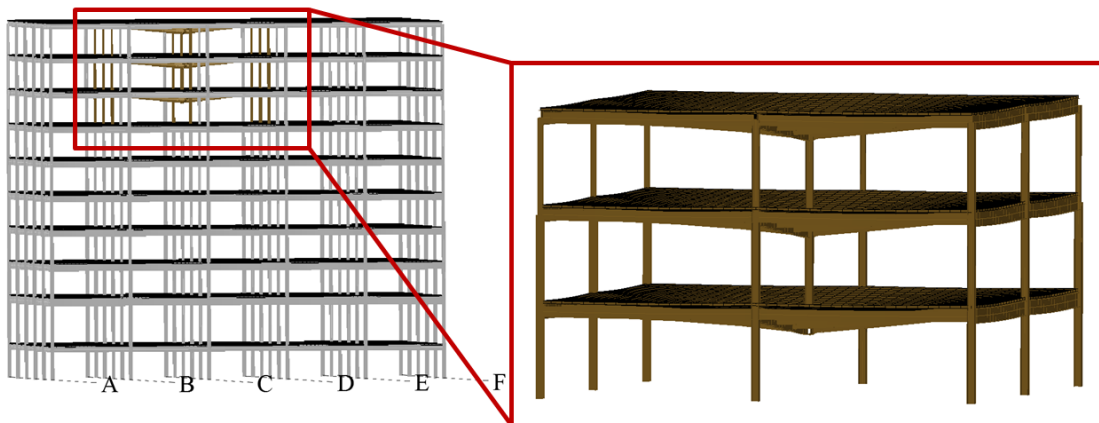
Deformed shape of structure – 7th floor column removal scenario
